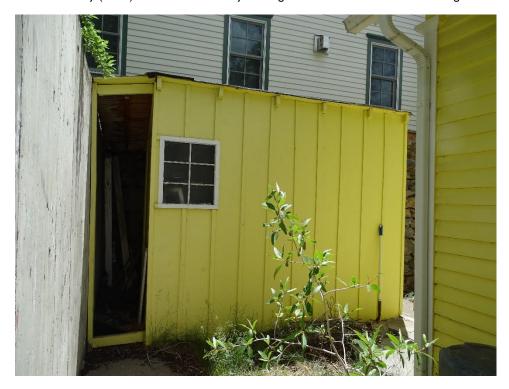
West elevation of the utility building at 187 Clear Creek Street. Looking southeast.
